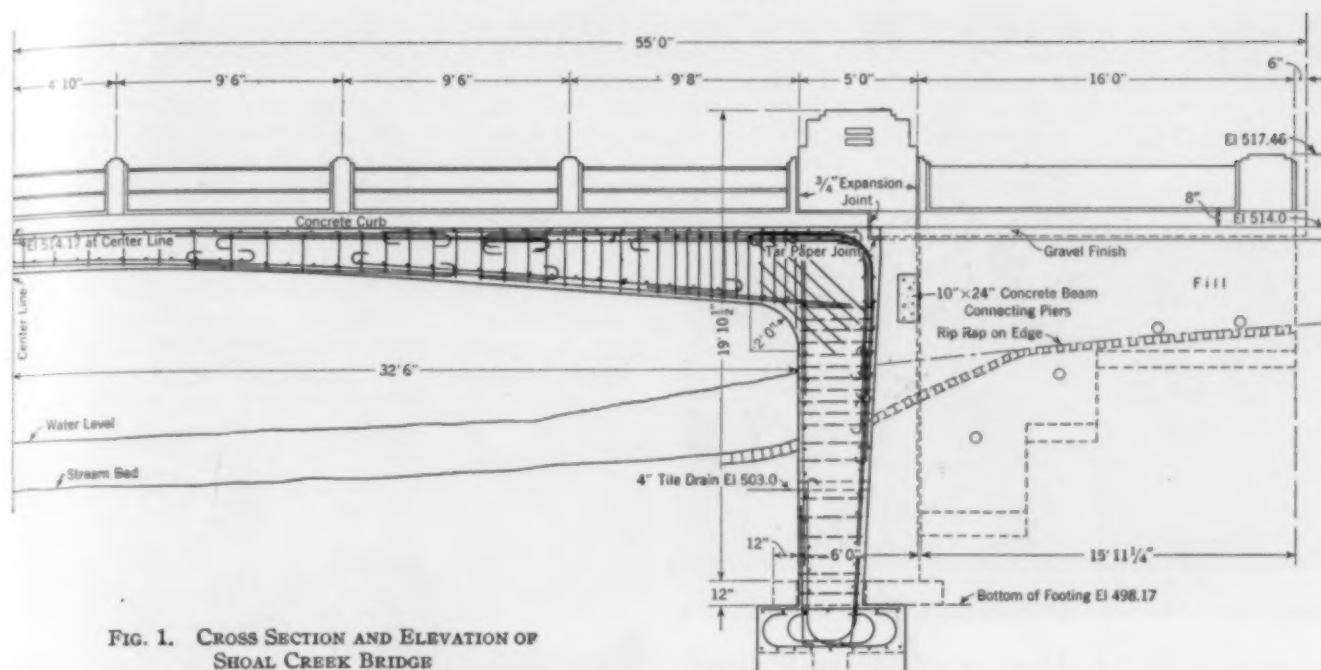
CROSS SECTION AND ELEVATION OF SHOAL CREEK BRIDGE
